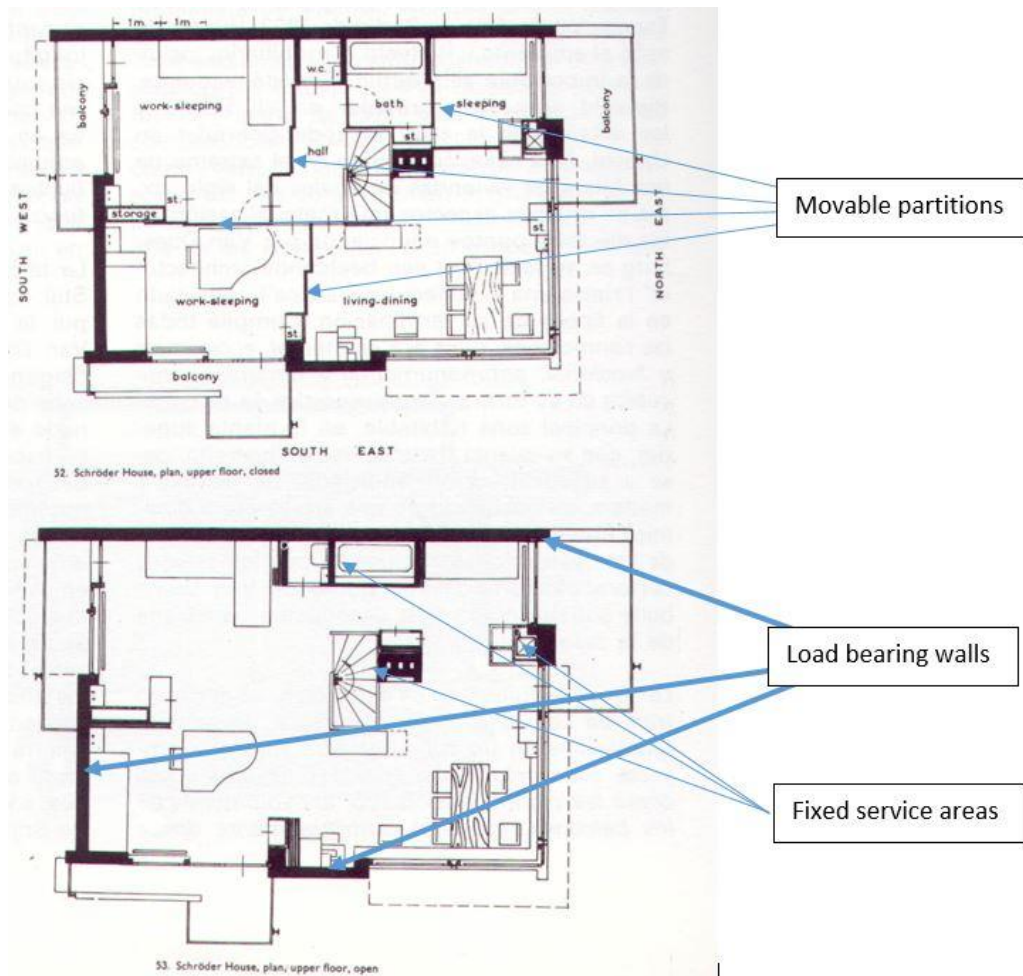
Showing the fix parts and movable parts of Schroder house. (Kronenburg, 2007)
